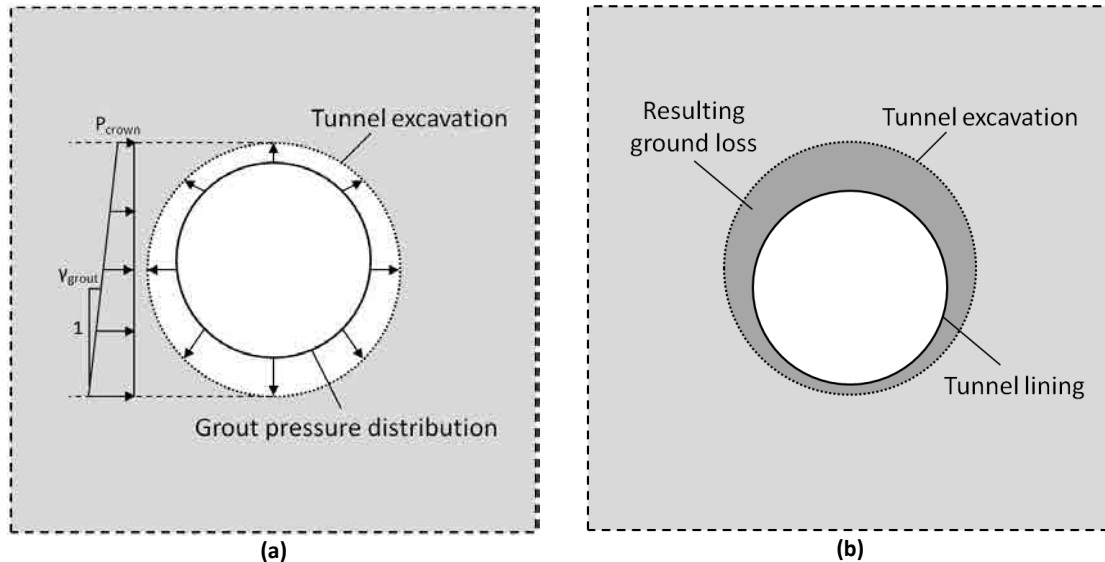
Grout Pressure Method scheme. (a) Stage 1: grout pressure application. (b) Stage 2: tunnel lining installation.
